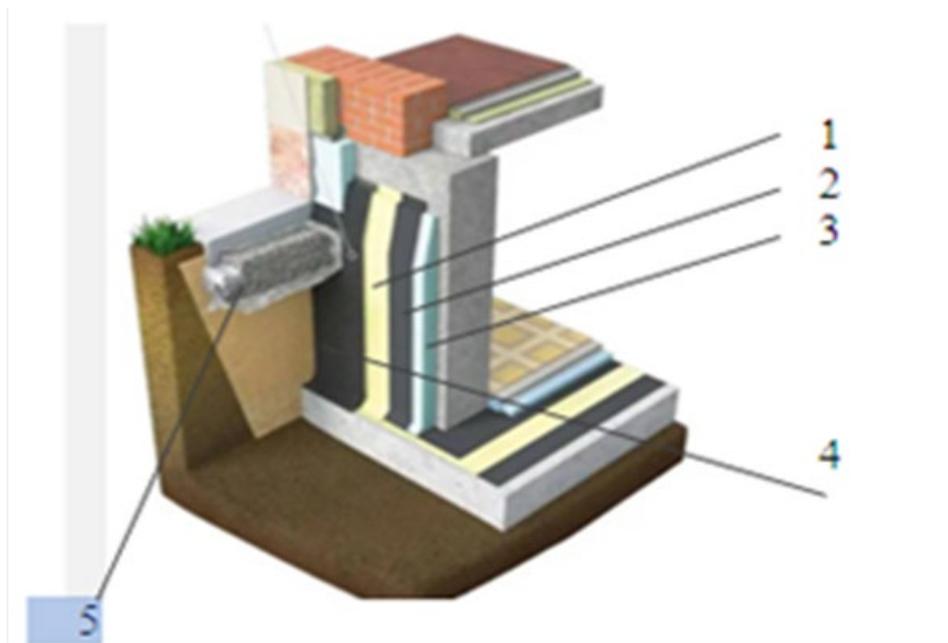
Foundation of a private strip-type house (ground floor) 1 - waterproofing, 2 - protective geotextile, 3 - thermal insulation, 4 - Izolit, 5 – Typar
